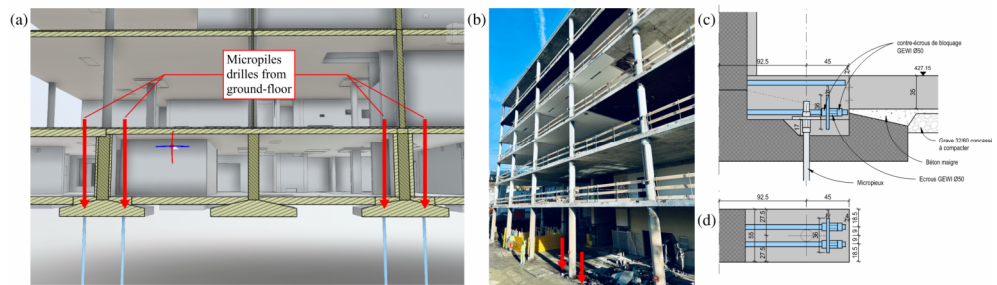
Strengthening of foundations: (a) section view of building; (b) construction site; (c) section view of reinforcement detail; and (d) plan view of reinforcement
